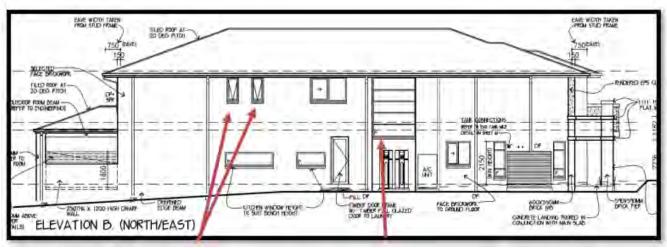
Proposed Elevation B (North-East elevation) with conditioned ensuite and staircase windows as indicated with the red arrows.
